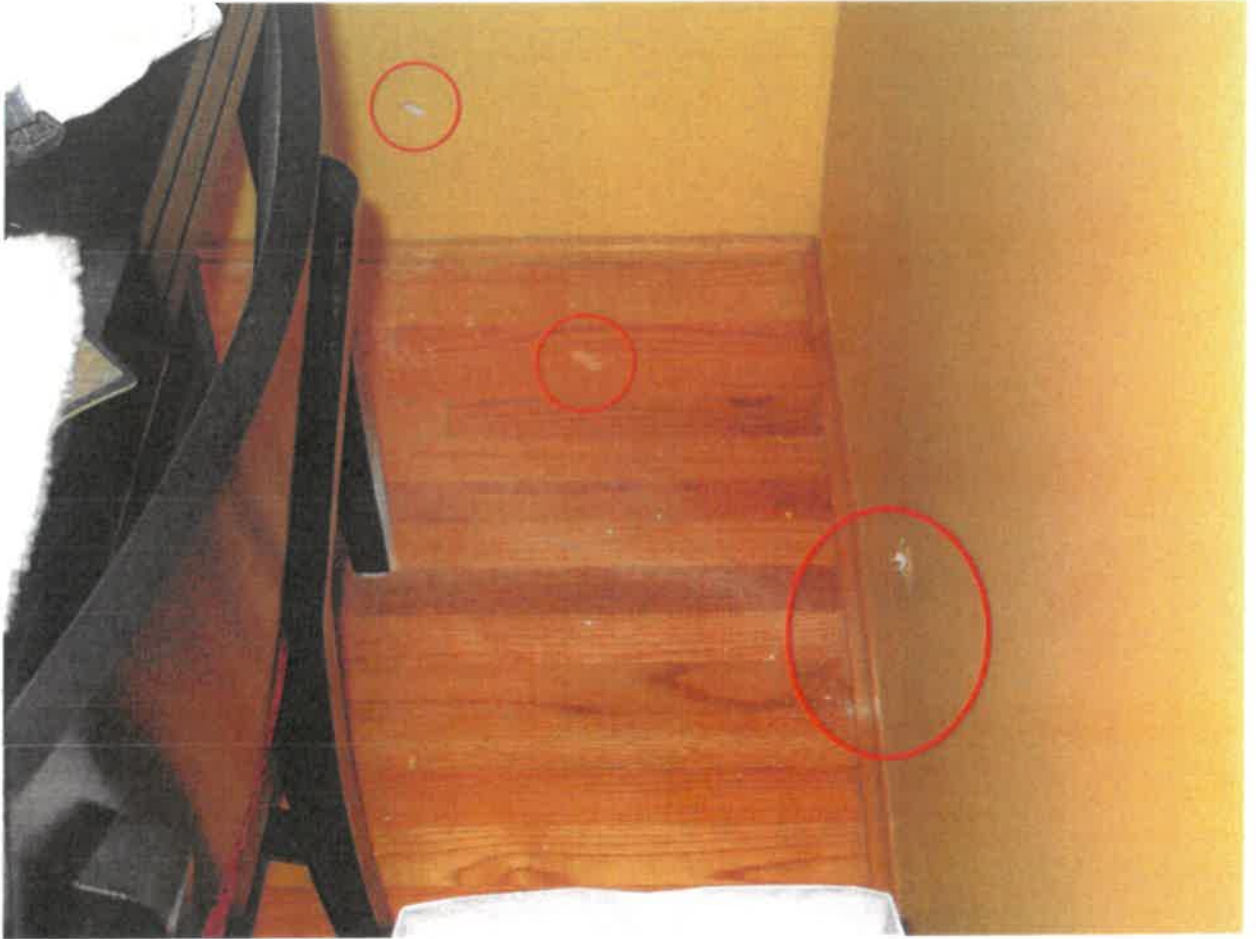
IMG_2222.jpg: Dining room floor and walls
